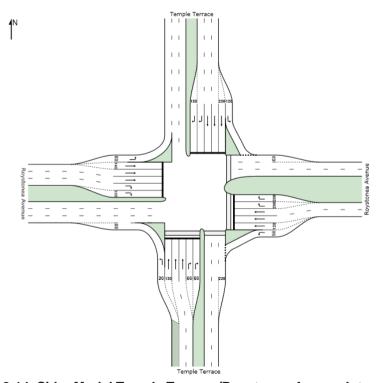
Sidra Model Temple Terrace /Roystonea Avenue Intersection
